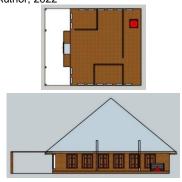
Cross section of the Kampung Wana traditional house model Source: Author, 2022
